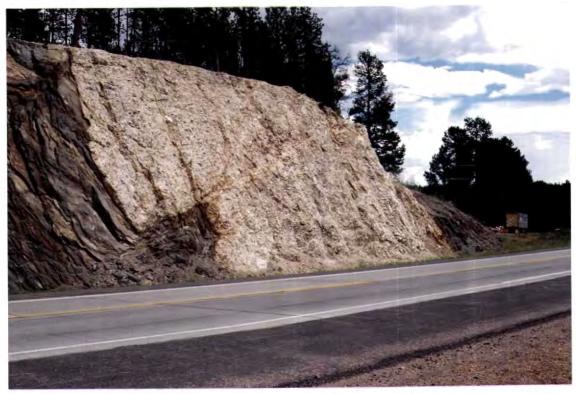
View of cut slope from across the highway. Note the minor plane failures at left.
